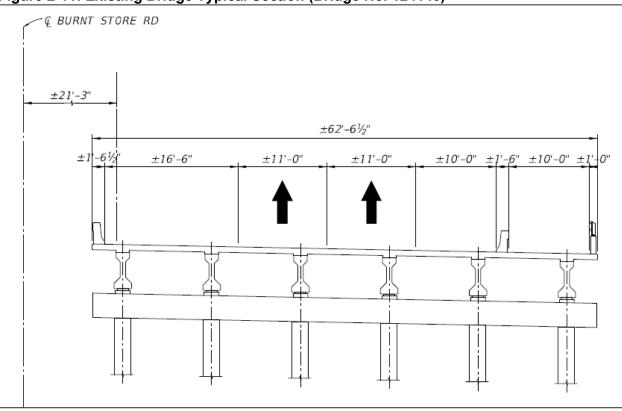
Existing Bridge Typical Section (Bridge No. 124140)
